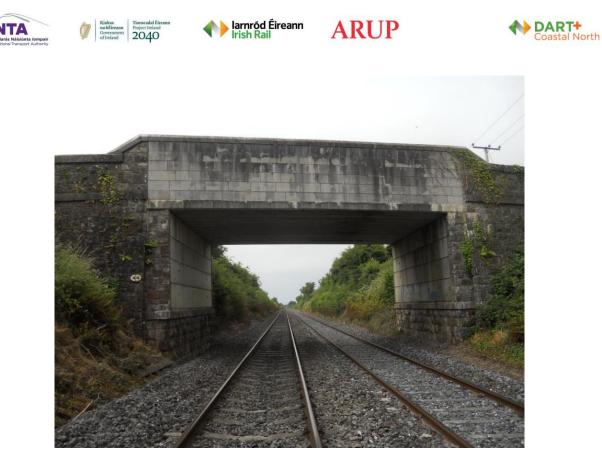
Bridge elevation looking towards Dublin (source: larnród Éireann)
